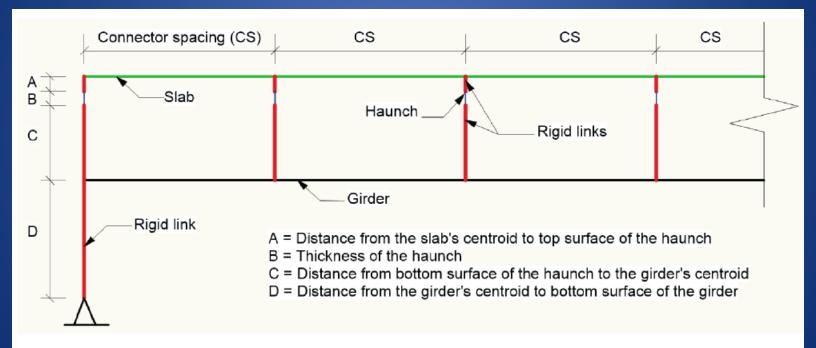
Vierendeel Model of a slab–girder composite system with discrete joints.
